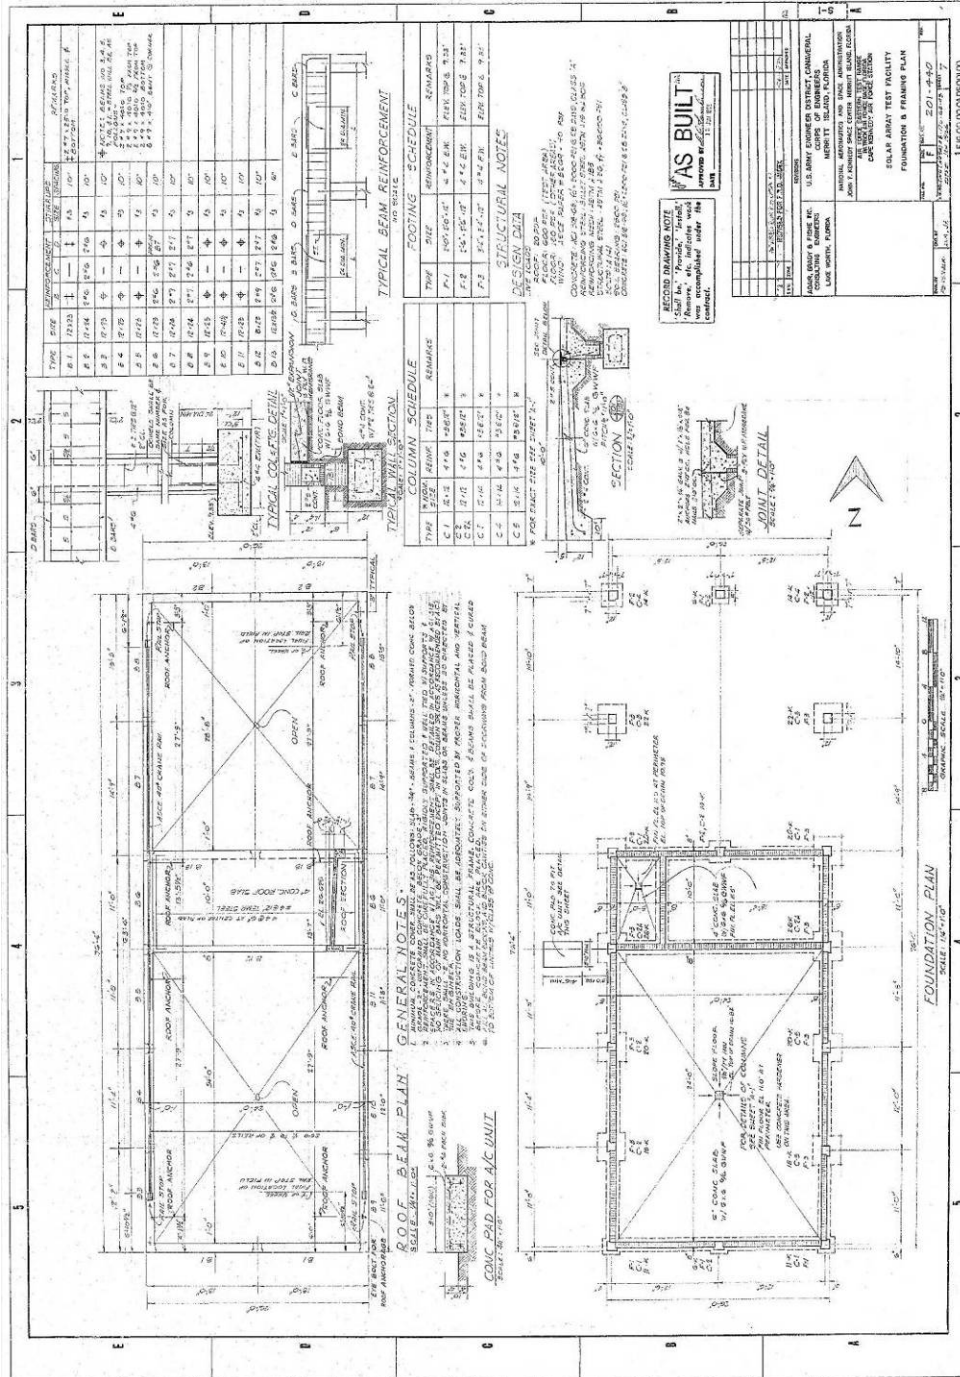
Adair, Brady & Fische, Inc., Solar Array Test Facility, Foundation & Framing Plan, January 1966, Sheet 7.
